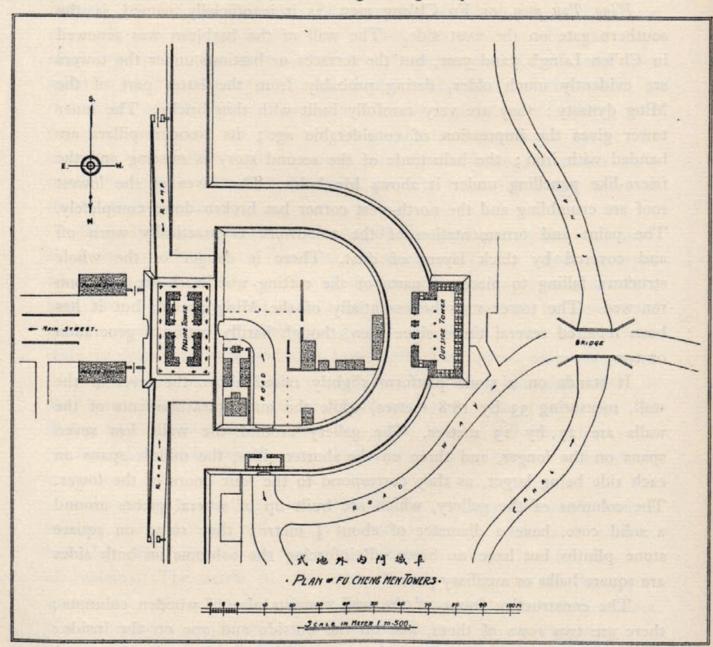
P'ing Tzu Men (also known as Fu Cheng Men), general plan.
